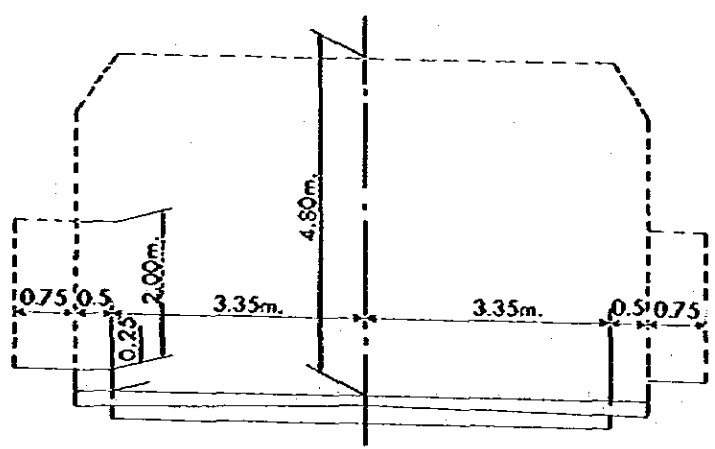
TYPICAL CROSS SECTION FOR MOUNTAINOUS SECTION
